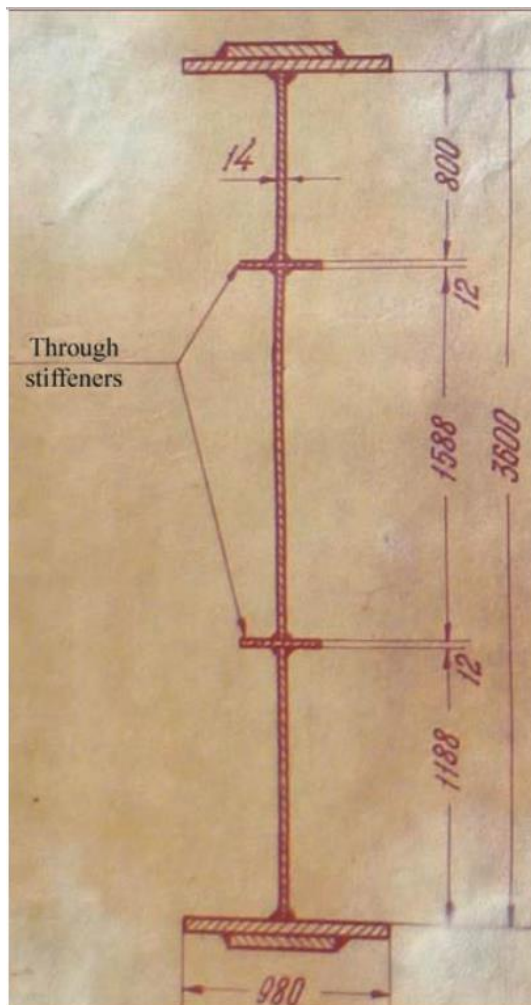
Cross-section of the truss of the main longitudinal beams of four- and five-span structures of the Evgeny Paton Bridge (Poznyakov, Dyadin, Davydov, & Dmytrienko, 2021).
